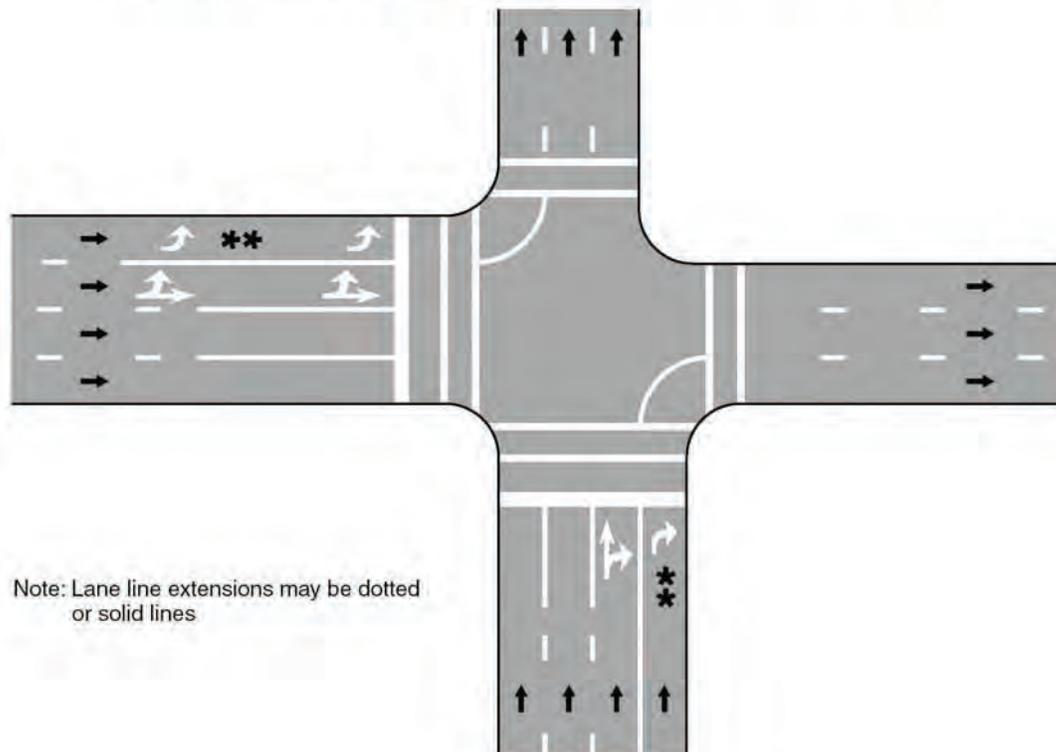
B-11. Examples of Extensions through Intersections (Sheet 2 of 2)
